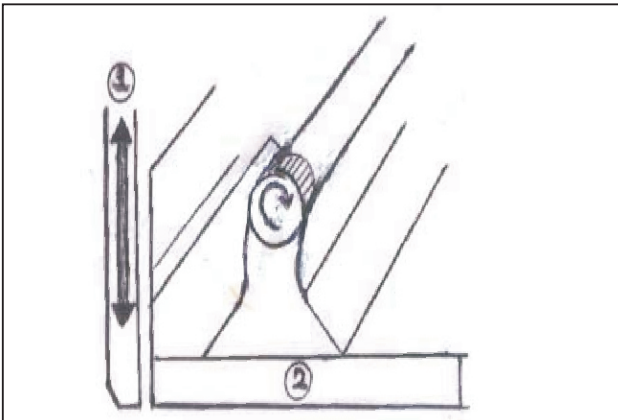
Tamping Unit Combined with Vibrating Screed
